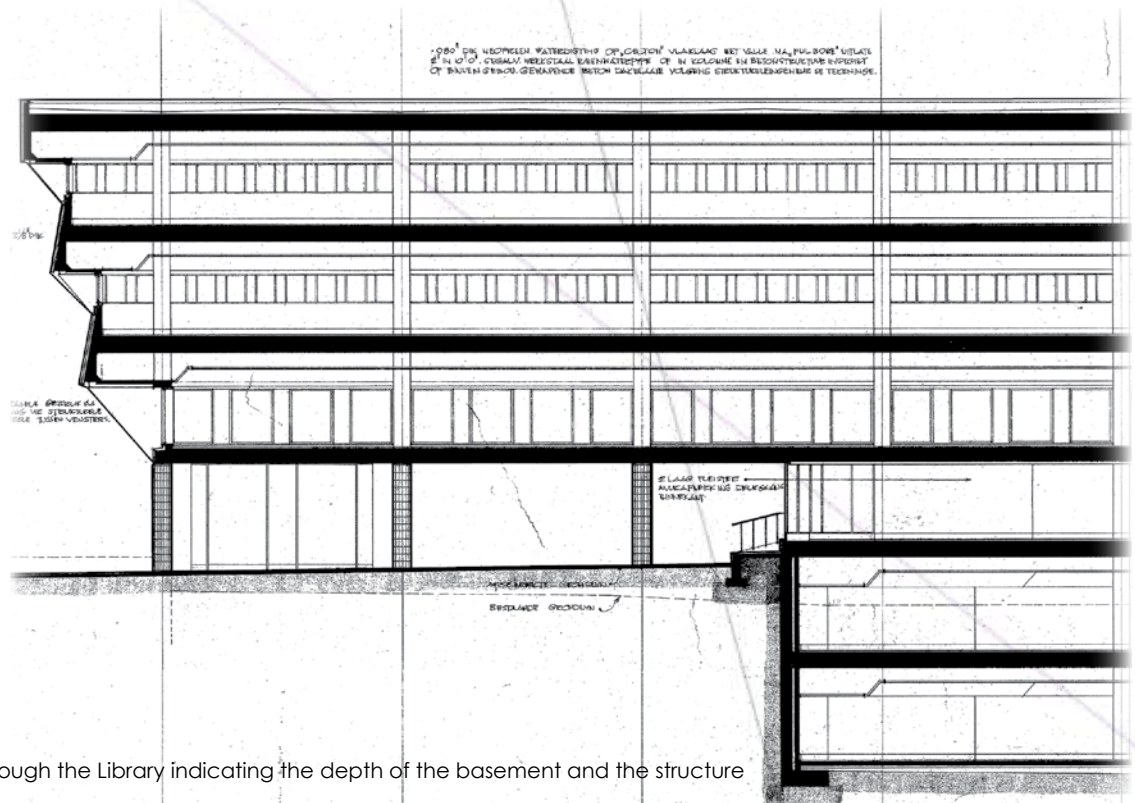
Original section through the Library indicating the depth of the basement and the structure
